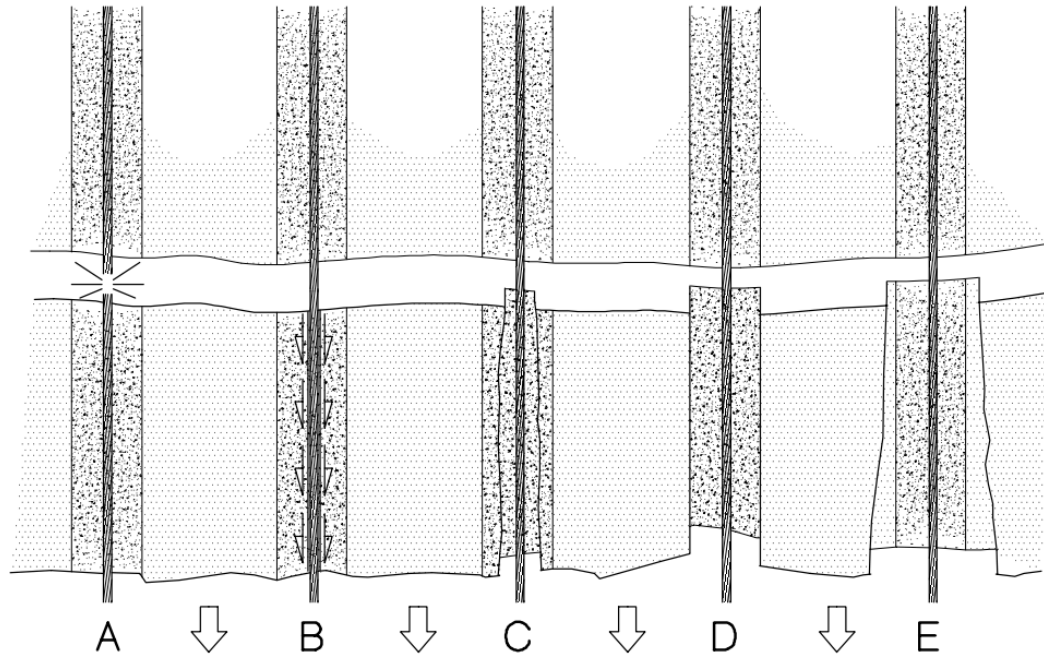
Bolt reinforcement failure modes (Hutchinson et al., 1996)
